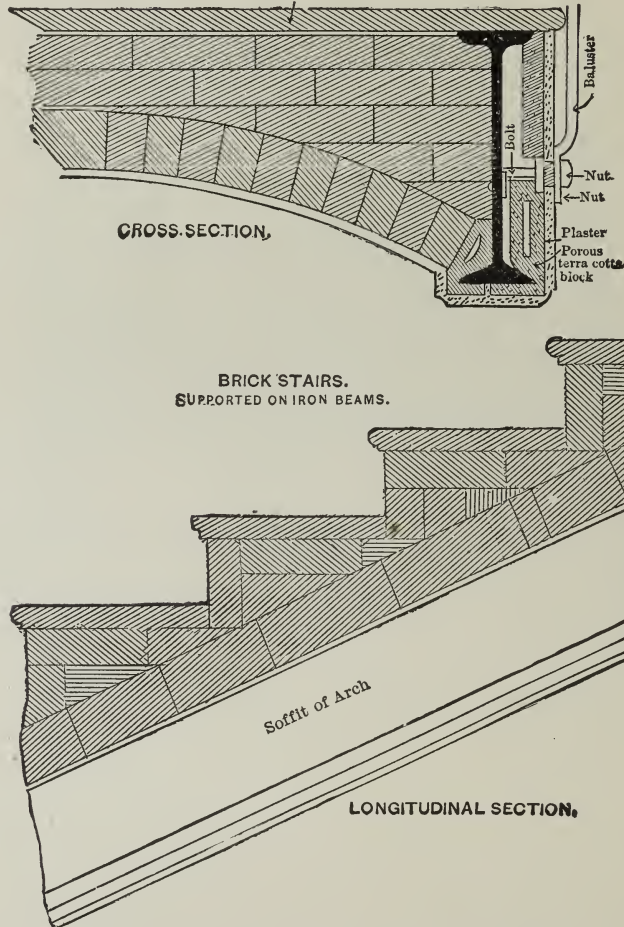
Details of Brick Stairs, Pension Building, Washington, D. C.
